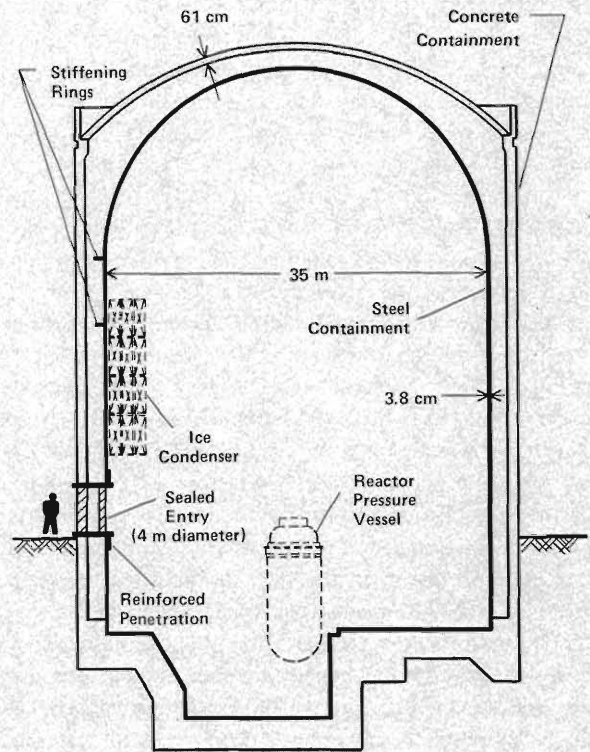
One type of steel and concrete containment for the main reactor building. A large reinforced penetration for personnel and equipment access is shown; other smaller penetrations would be included for pipes and cables. The heavy ice condenser attached to the wall is an example of a source of asymmetrical loading that could lead to buckling during an accident. The reactor pressure vessel and its associated coolant system constitute another containment barrier within the containment building.
